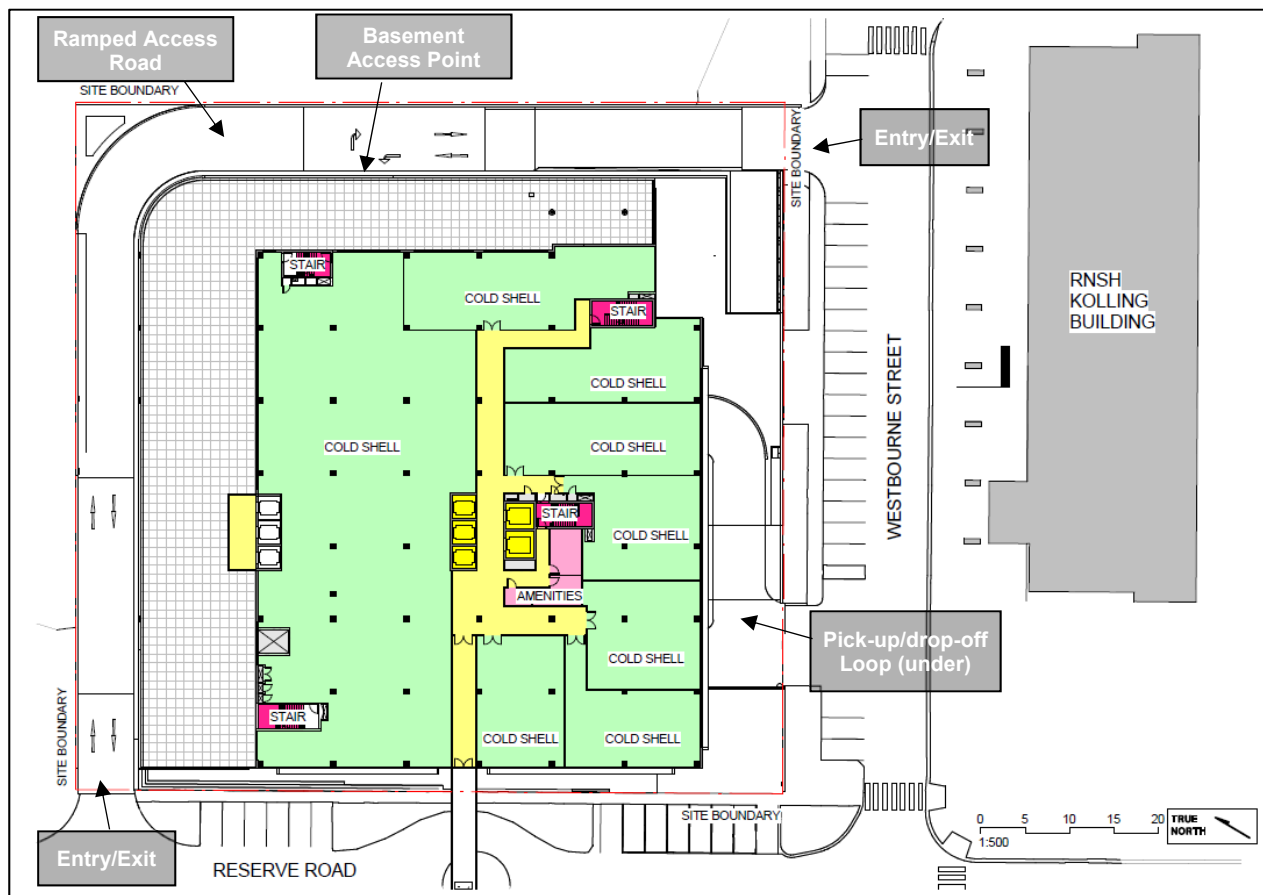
Proposed vehicle access (Base source: Tower A RtS podium level plan)
